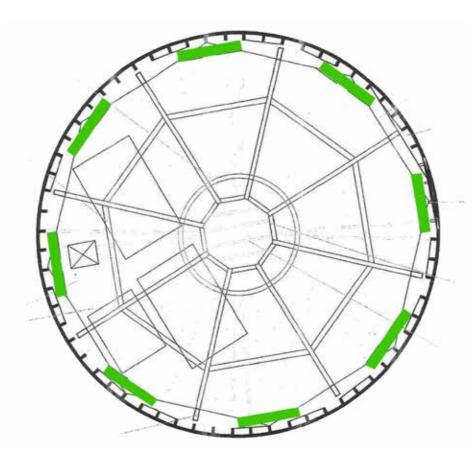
Horizontal rafter wall ties (M) in plan view (2019) © H&R (SLHA edit)
